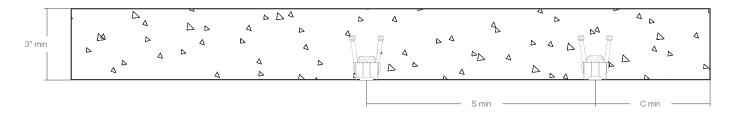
shows Spider Wood Form Low Profile Insert in 3 inch concrete slab.
